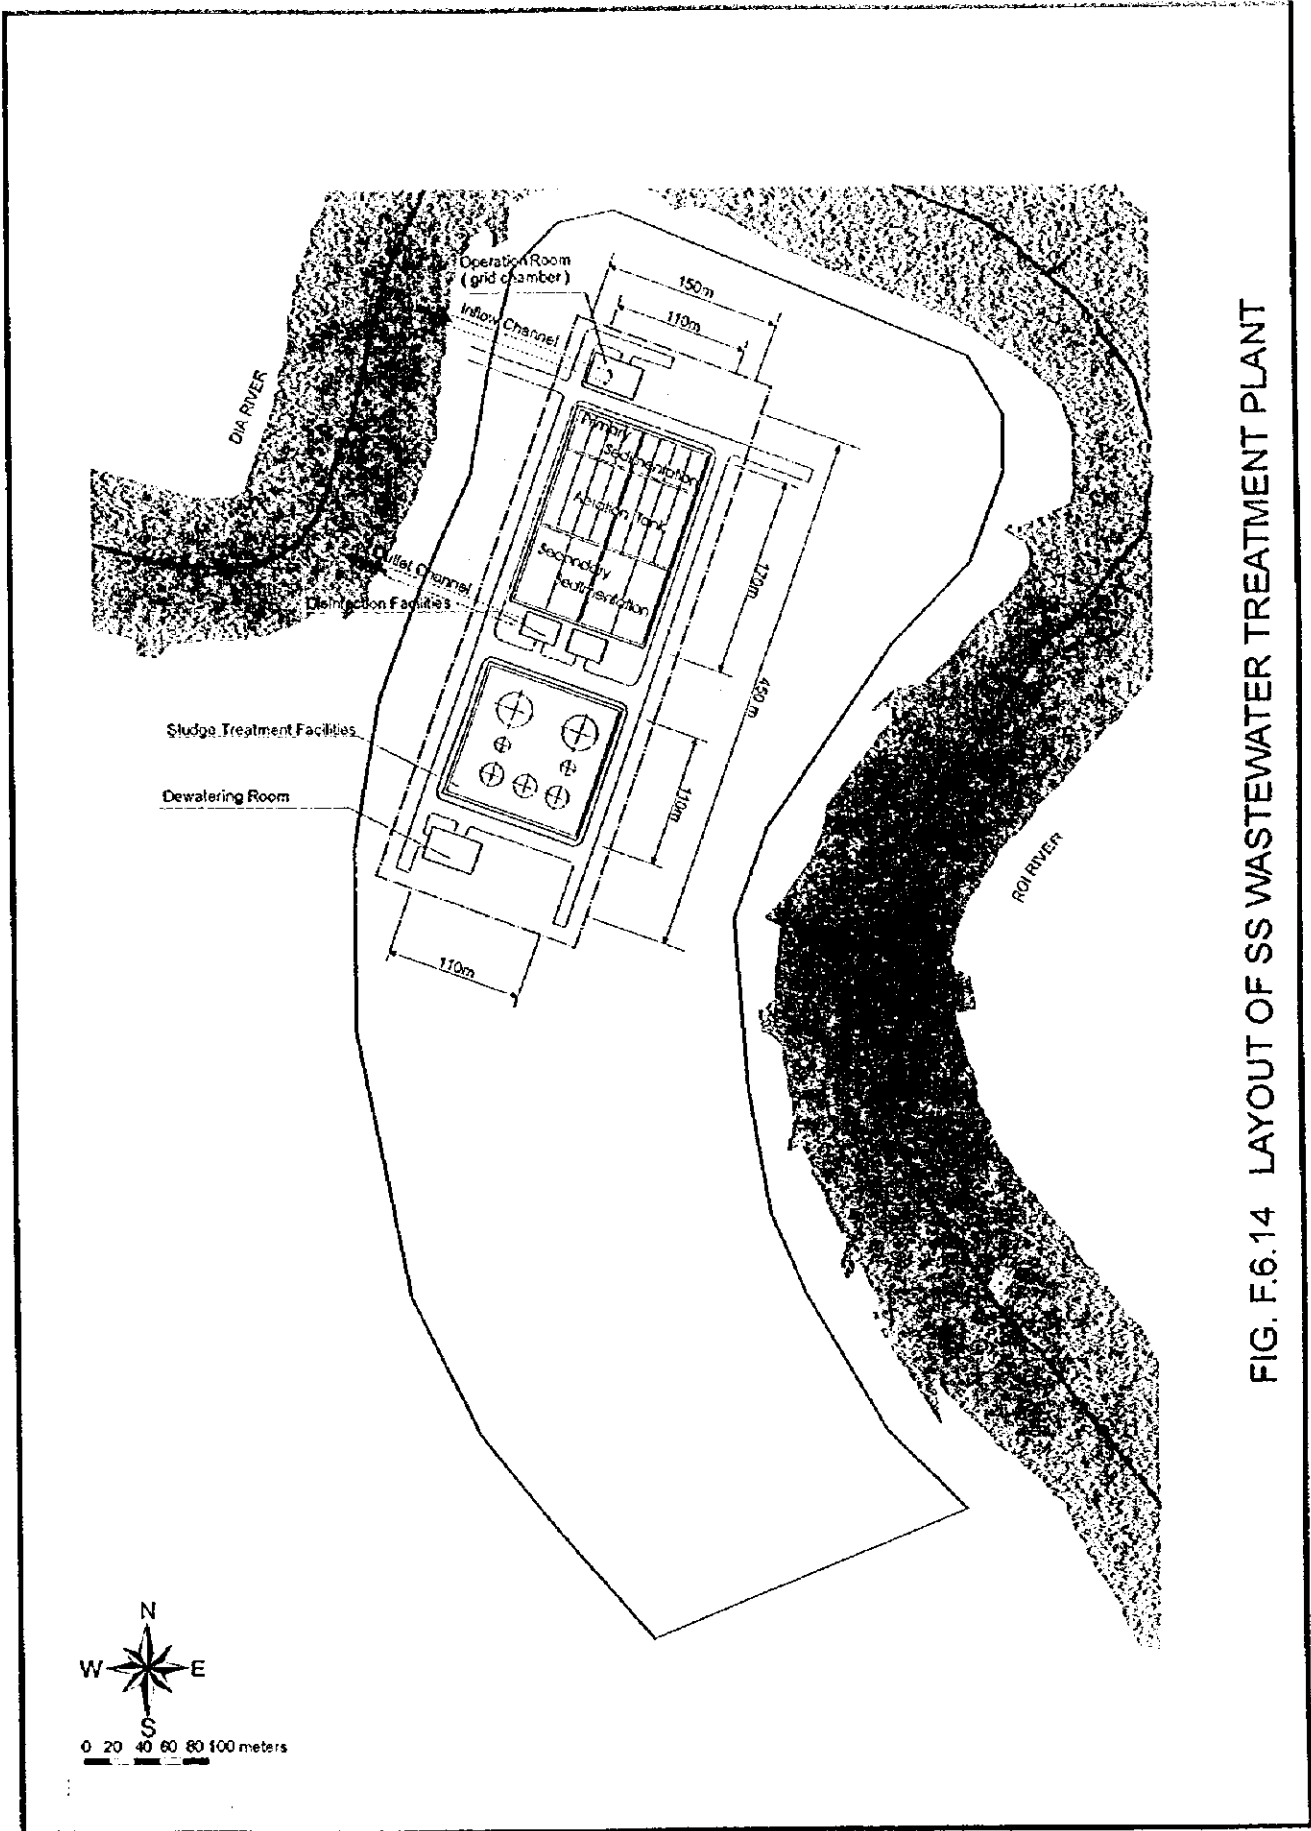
LAYOUT OF SS WASTEWATER TREATMENT PLANT
